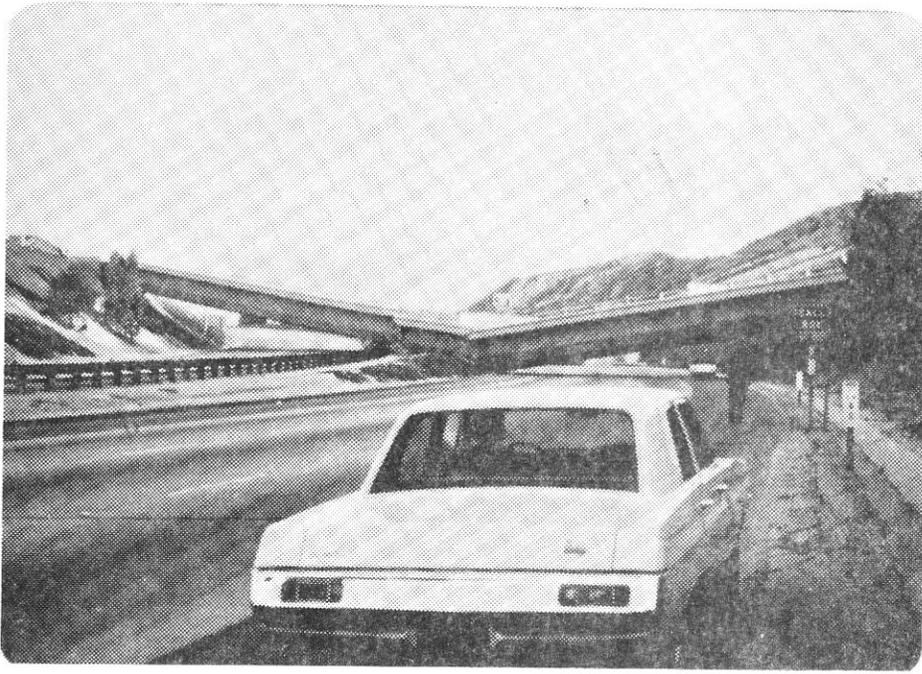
Looking northerly at the collapsed Route 5 southbound truck freeway bridge over Route 405.
